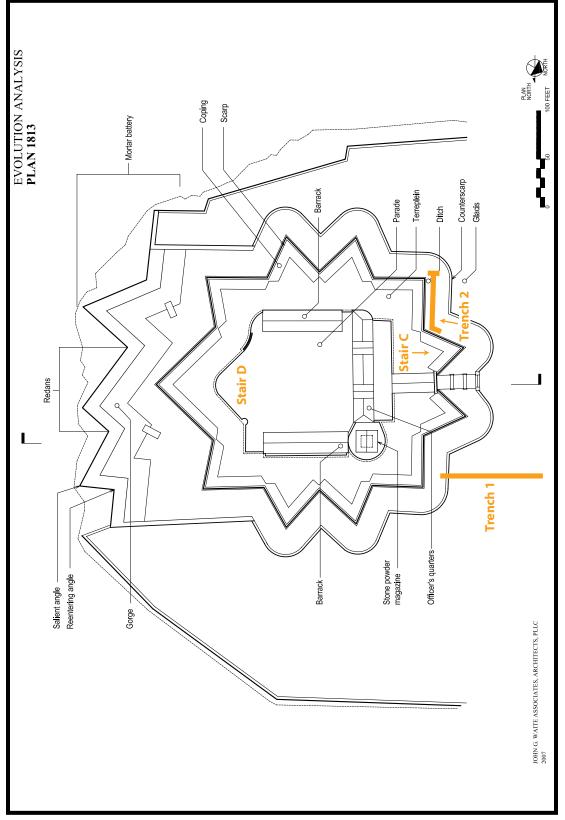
Plan of Fort Wood. 1813. Locations of Stairs C and D and Trenches 1 and 2 as indicated. Source: John G. Waite Associates n.d.
